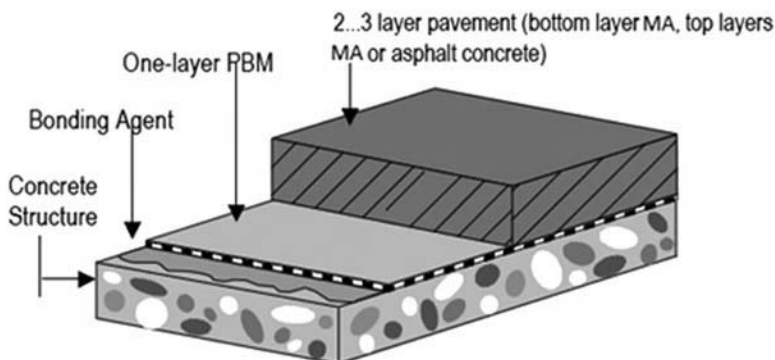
Scheme of a concrete bridge-deck waterproofing system [2].
